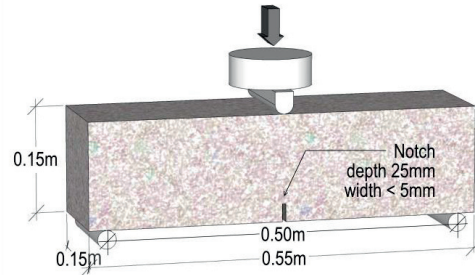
Dimensions of specimens for three-point bending testing.
